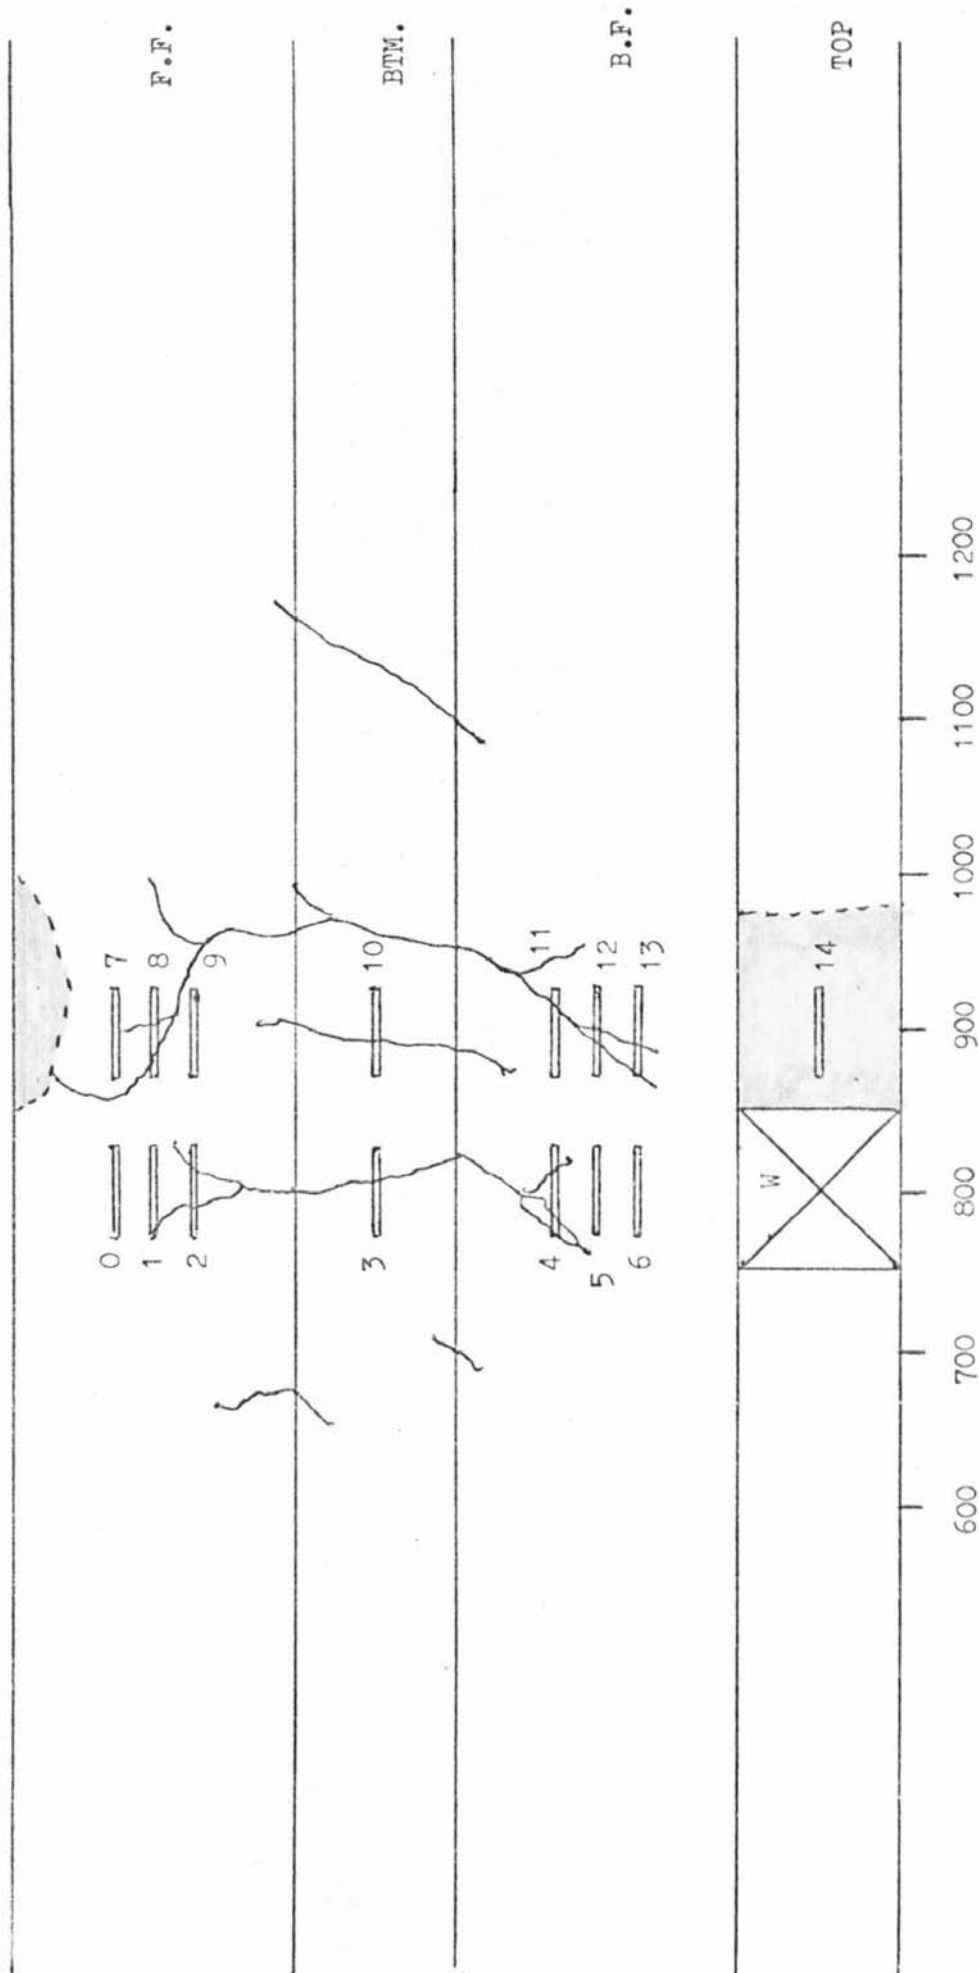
FAILURE CRACK PATTERNS - BEAM 35 ( MODE 1 )
